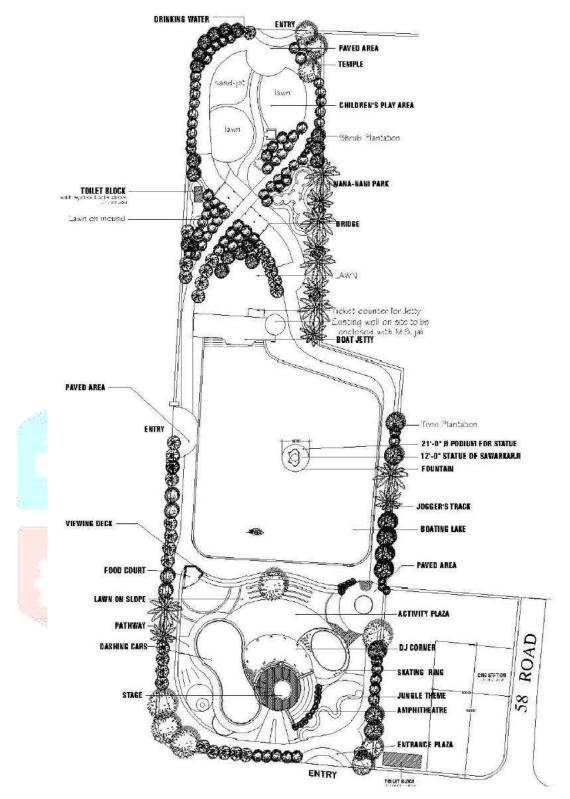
Existing Site layout plan of Veer Savarkar Udyaan
